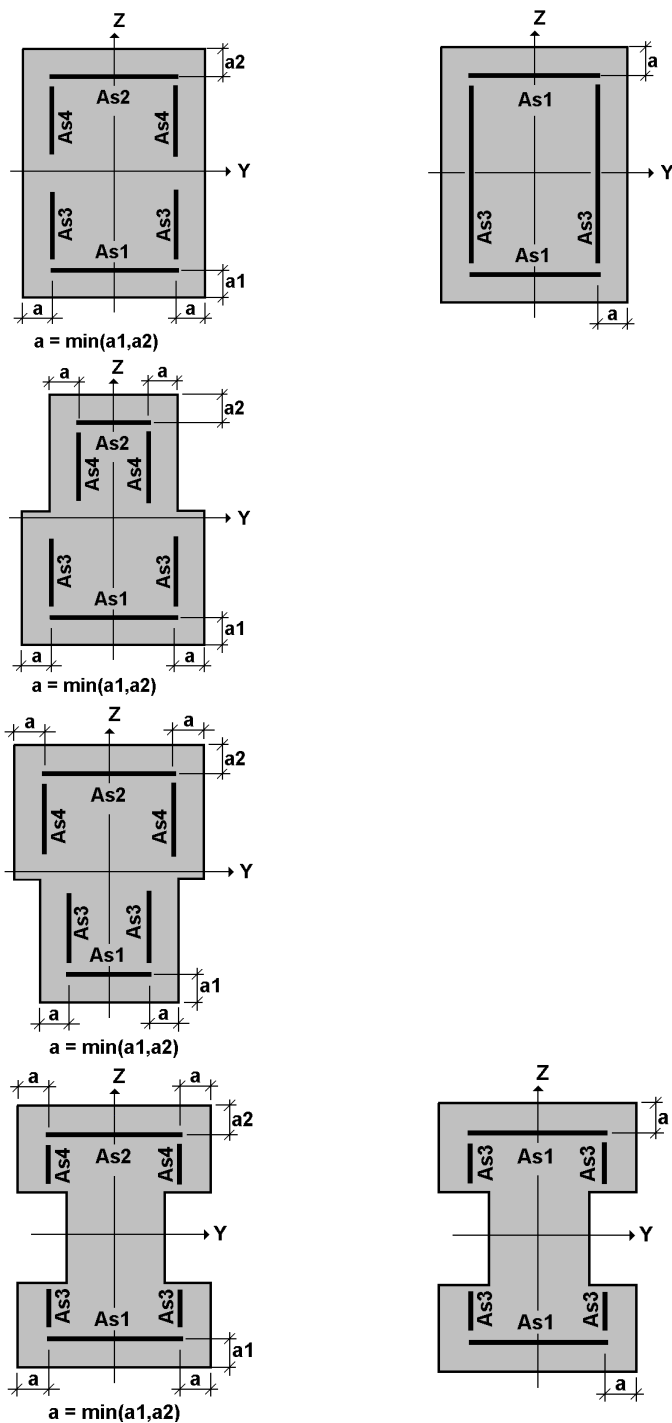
Arrangement of "areas" of longitudinal reinforcement
